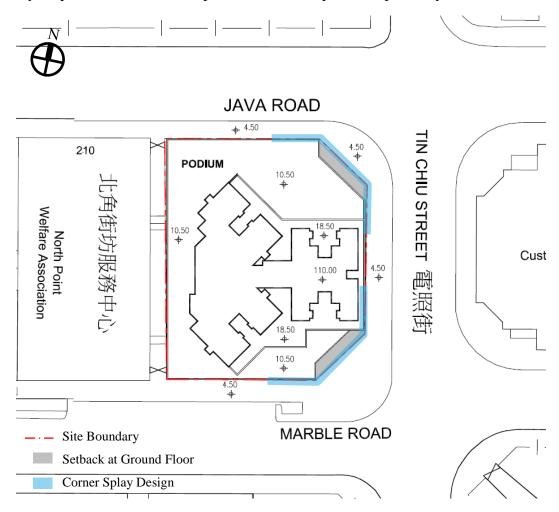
Site Layout Plan of the Development (site layout subject to detailed design)
